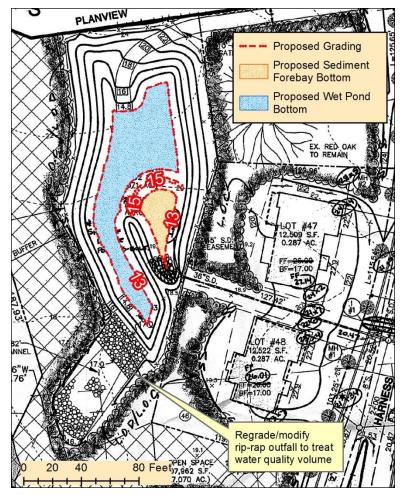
Proposed Retrofit Concept Design Detail Based on RWJ Associates Inc. 2001 As-Built
